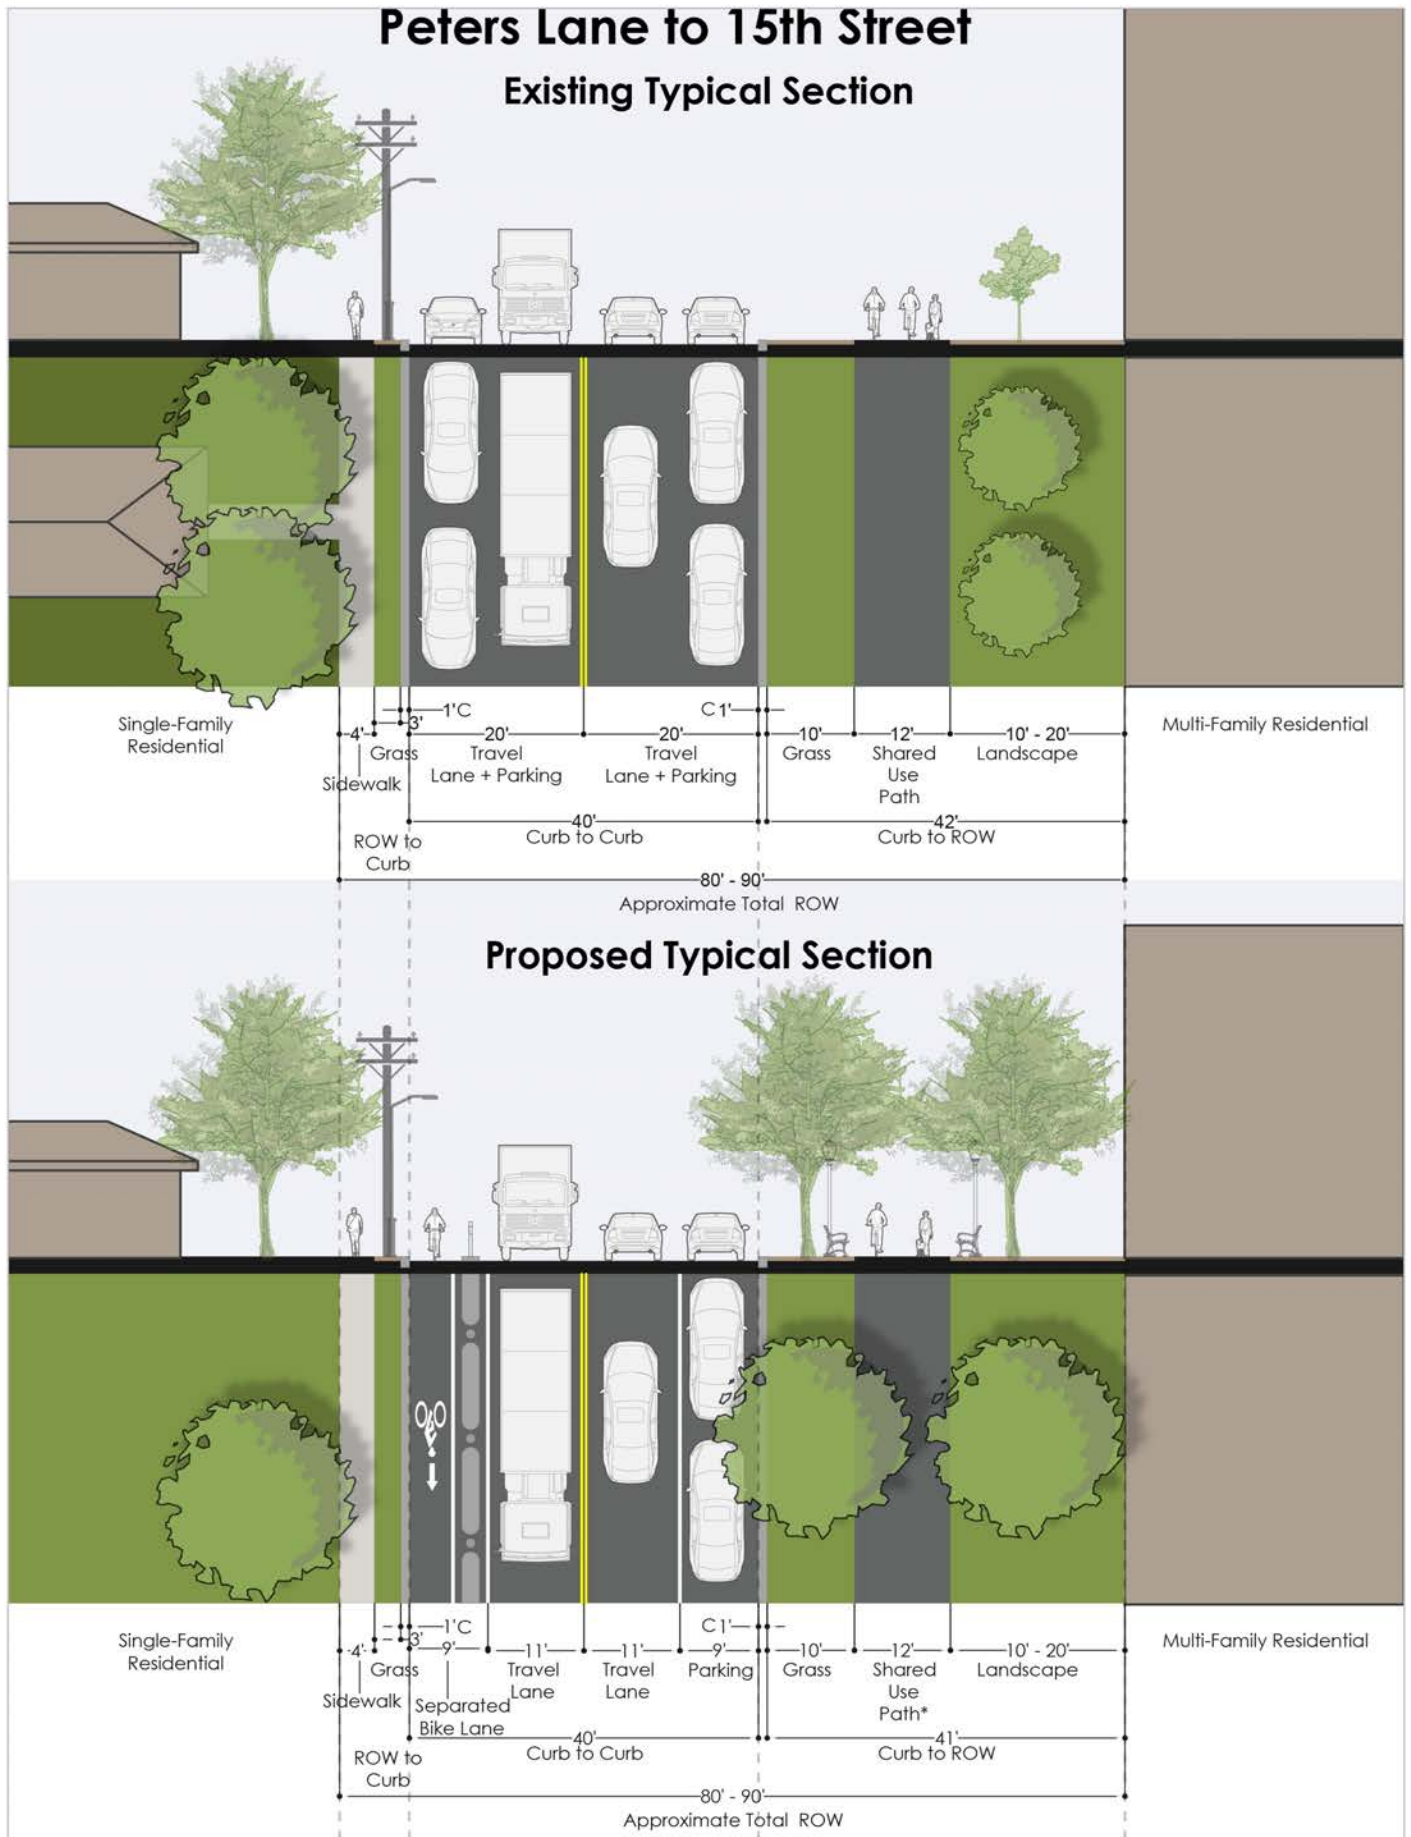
Existing and Proposed Typical Section - Peters Lane to 15th Street
